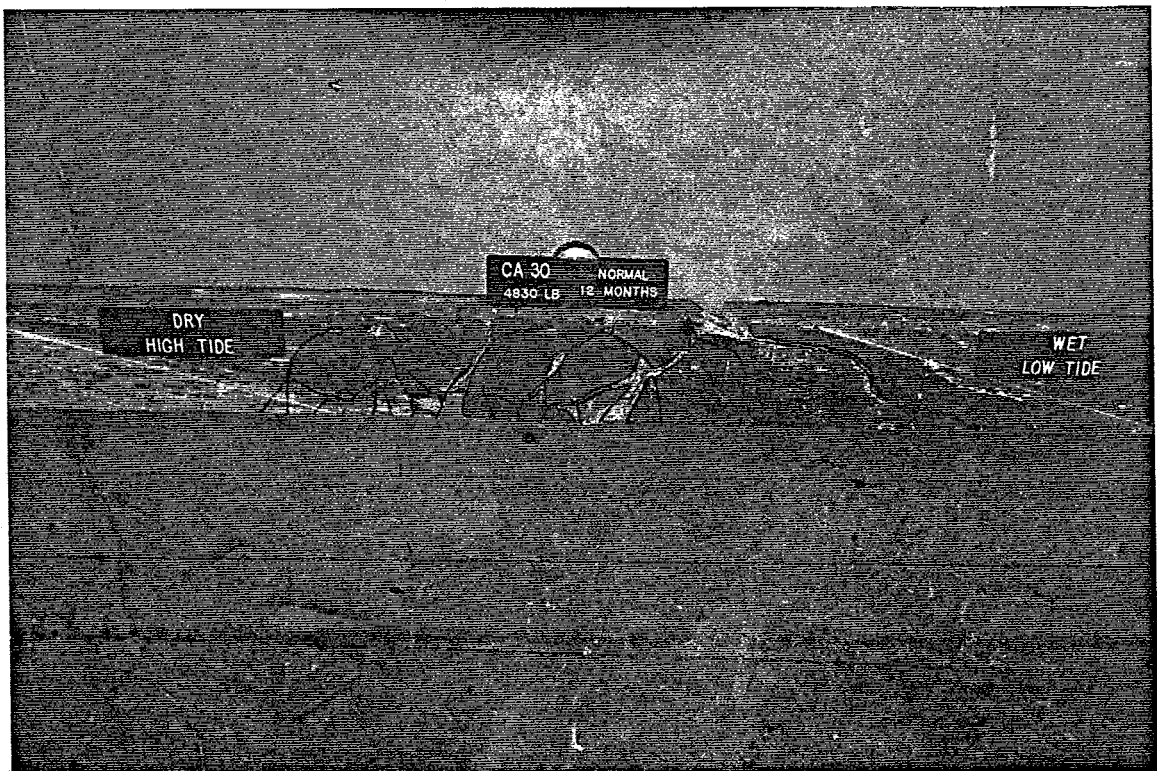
Crack Pattern for Beam CA 30 - Tested After 12 Months
